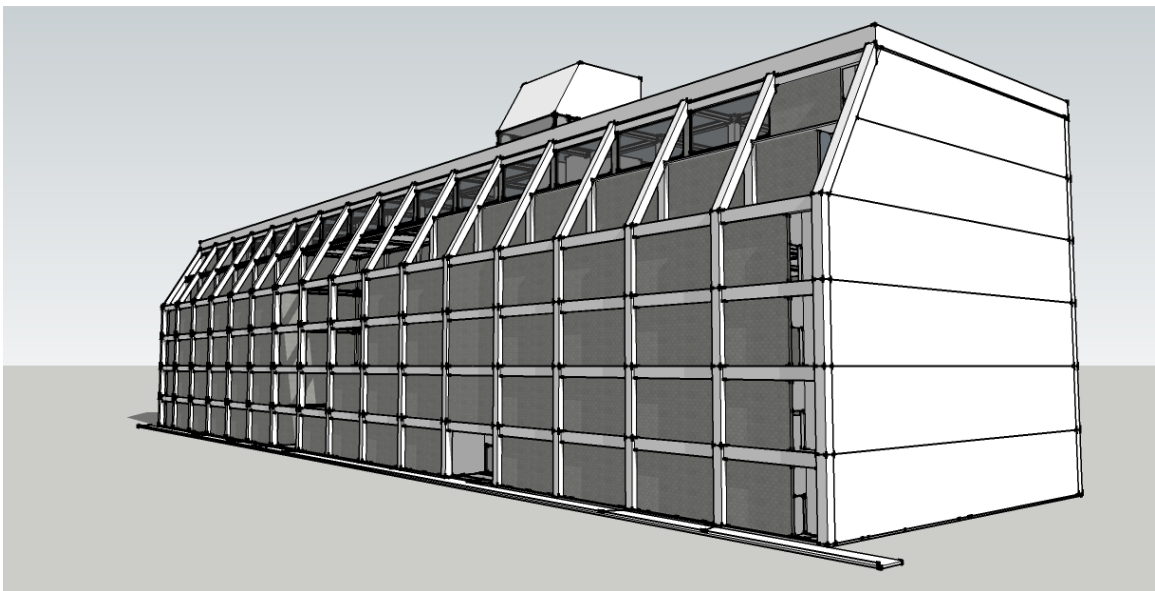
Existing Building Perspective - Structure vs. Infill Wall²⁴²
